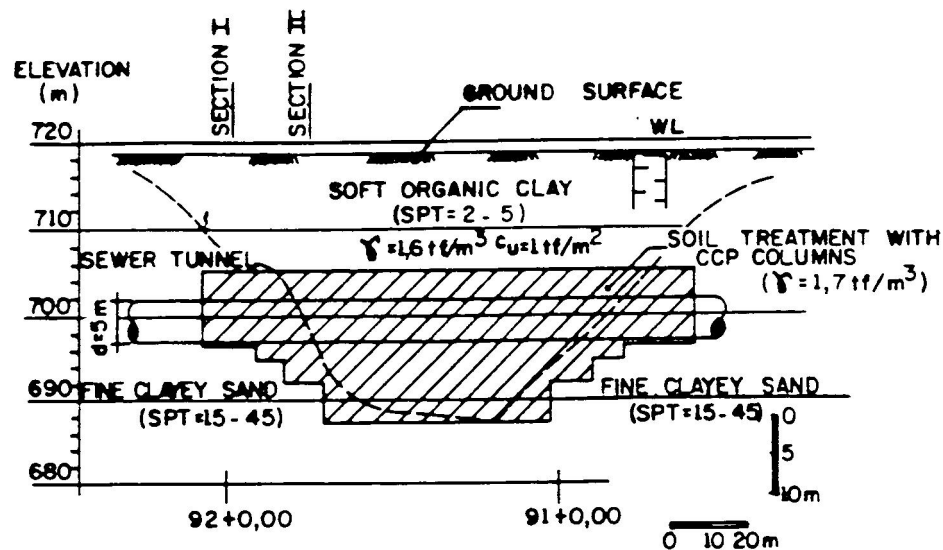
Longitudinal Section of Tiete Tunnel (São Paulo)
